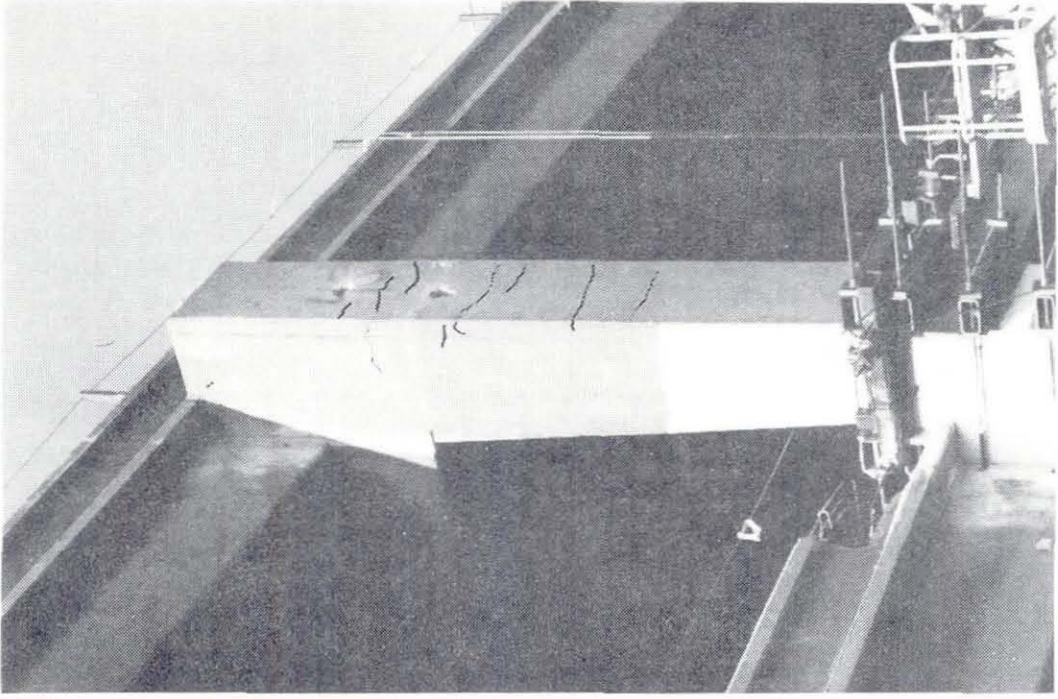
(b) Existing hairline cracks on the west face of Bent 46.
